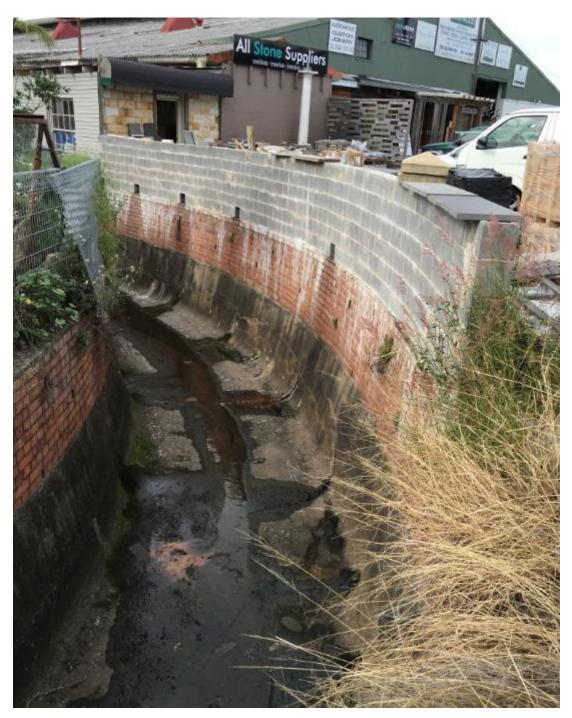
Easton Park drain adjacent to Lilyfield Road
